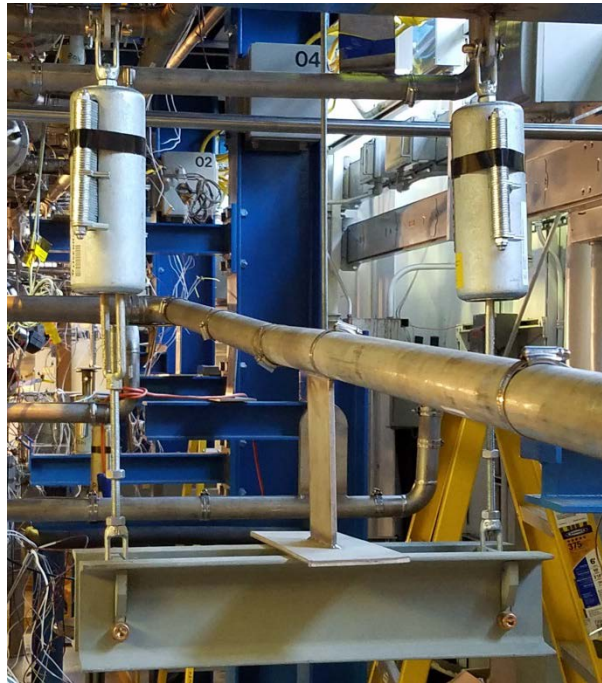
Picture of the piping supports. The spring can hangers are welded to the support steel underneath the mezzanine.
